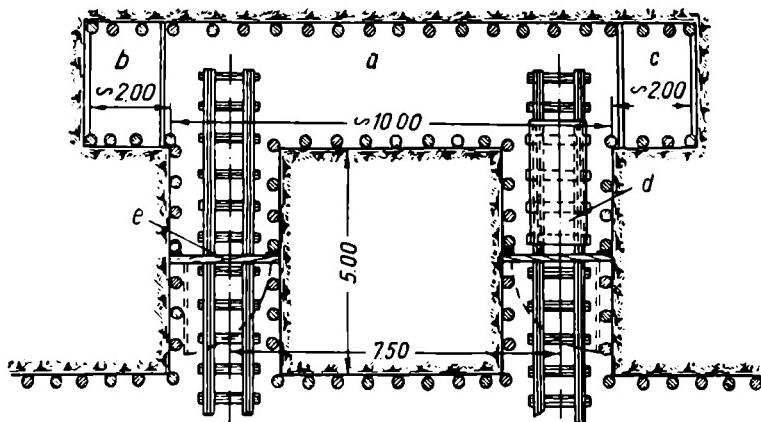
Underground storeroom for fire-fighting materials and equipment
